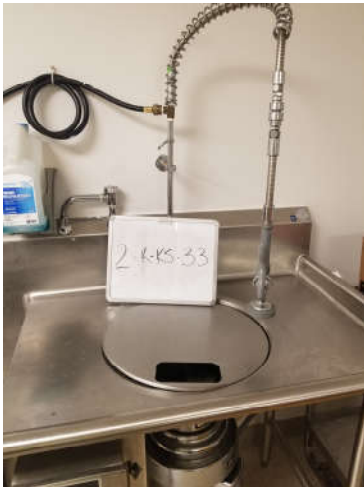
Kitchen sink, located on the 2nd floor in the kitchen.
